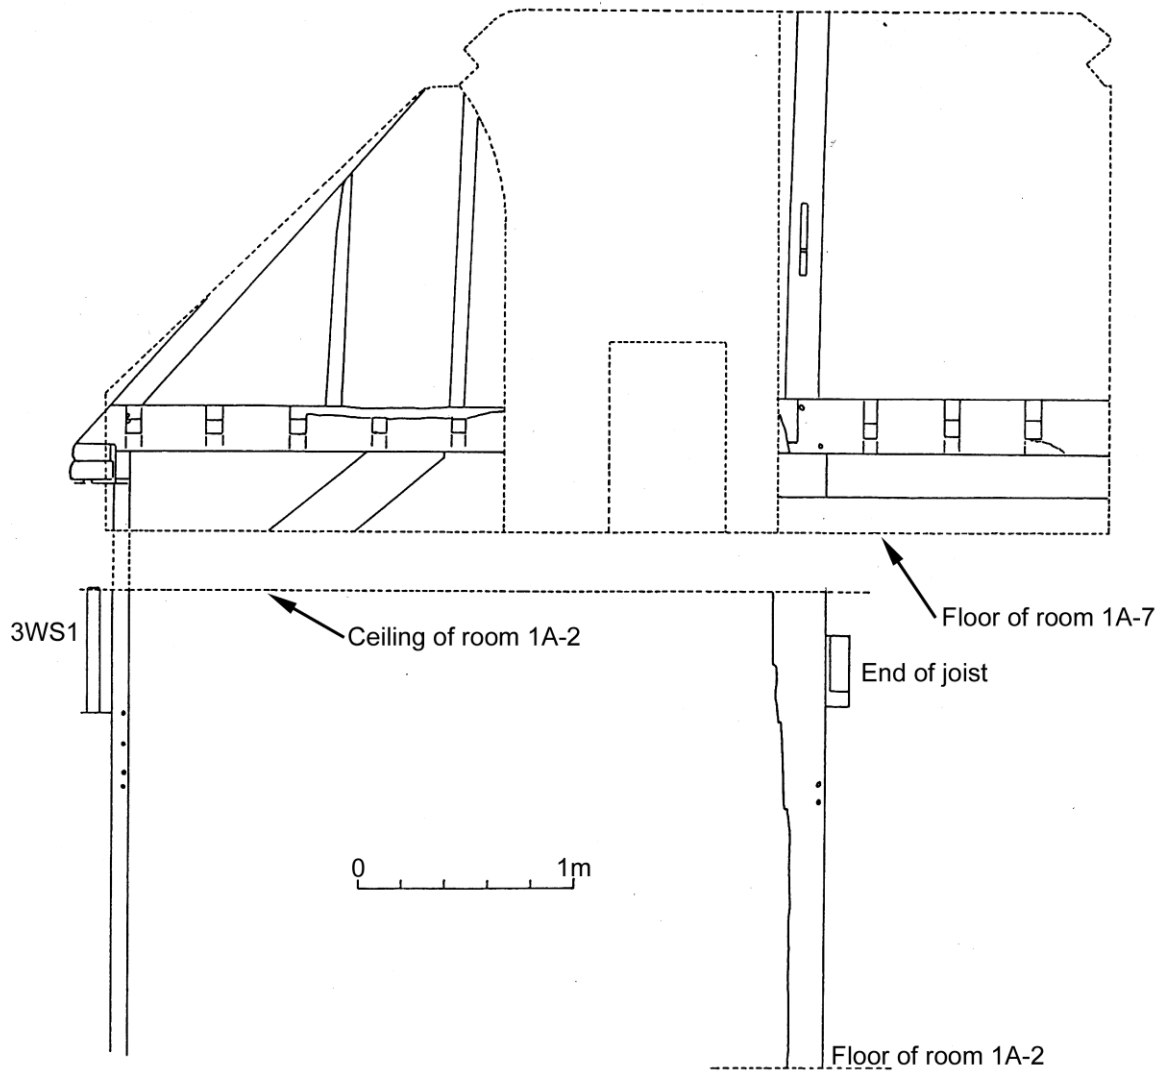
The south side of truss 3. Post 3E had gone. The chimney is not shown below the first floor.
